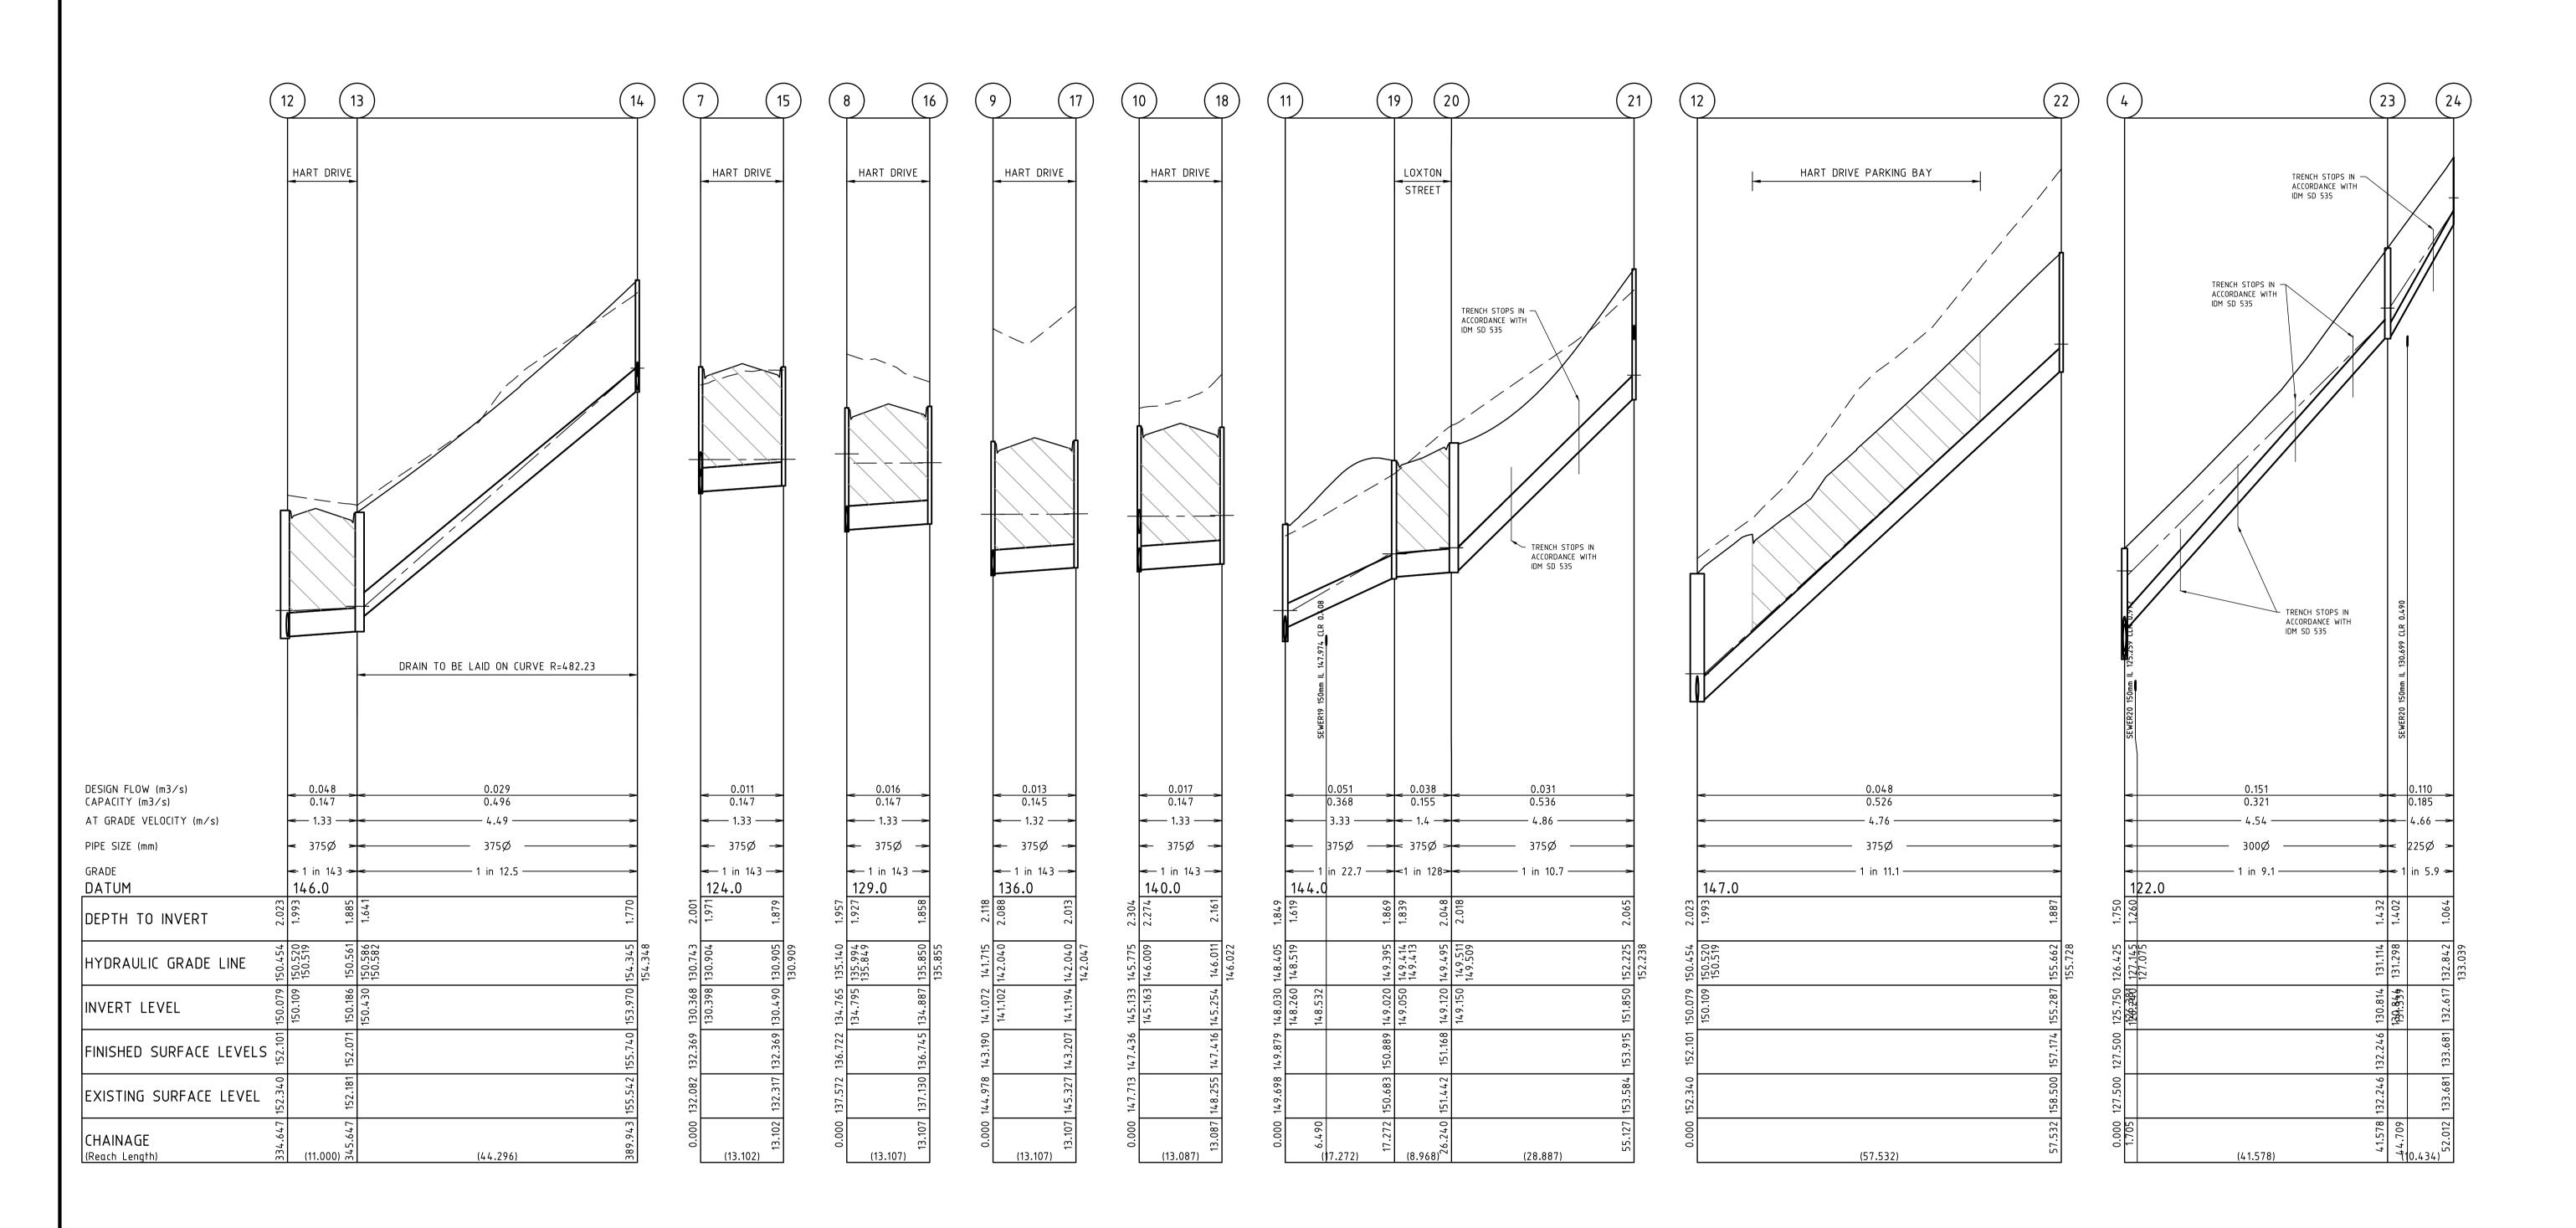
Sheet No. 17 of 23
